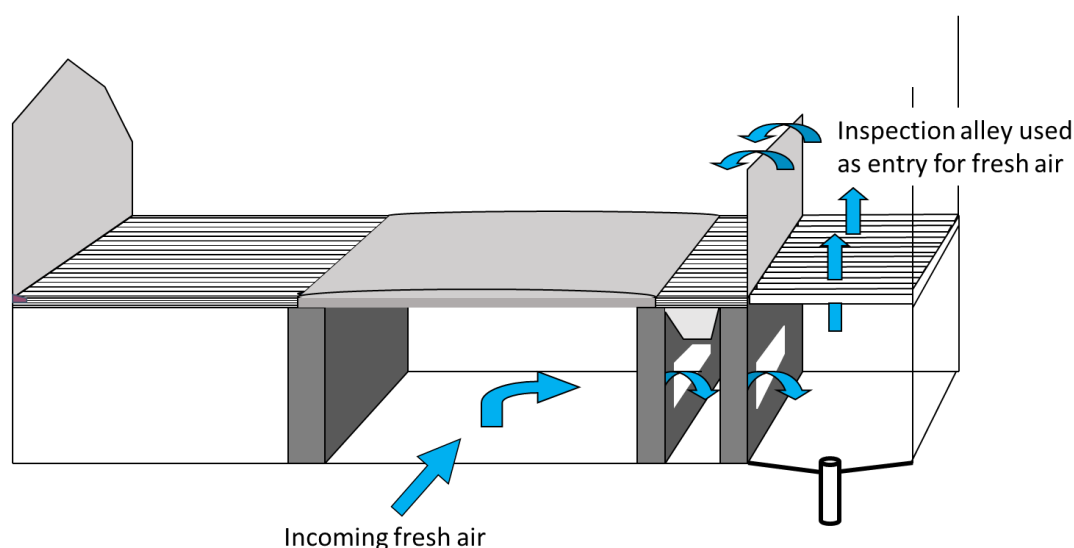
Cross section of underfloor air inlet in a pig house (©WUR)
